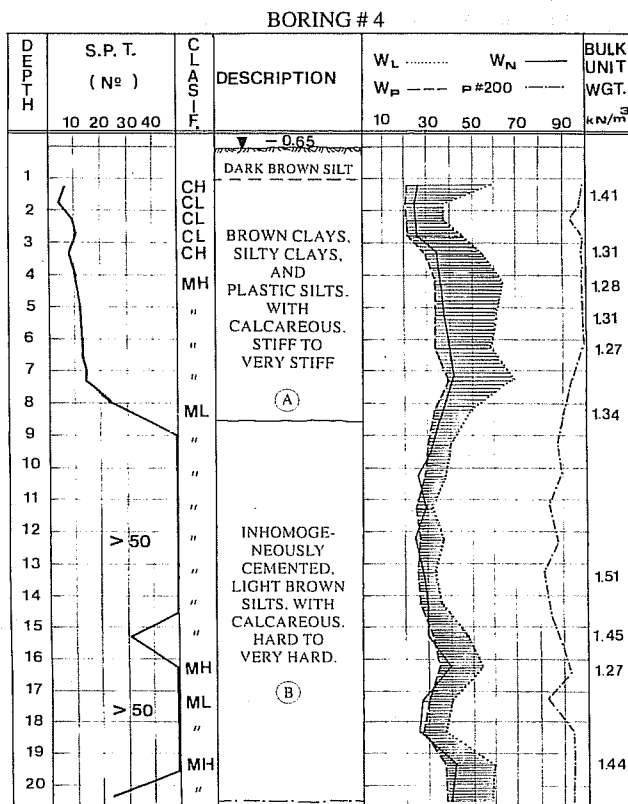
TYPICAL LA PLATA SUBSOIL PROFILE
